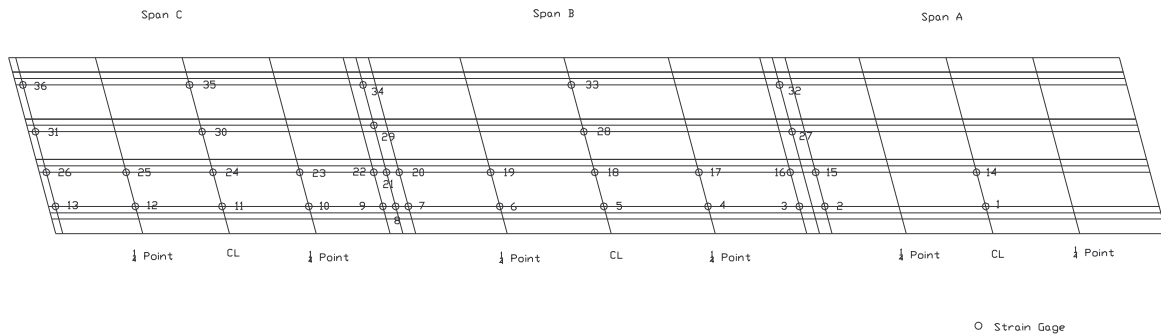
Bridge Instrumentation – Strain Gage Location
